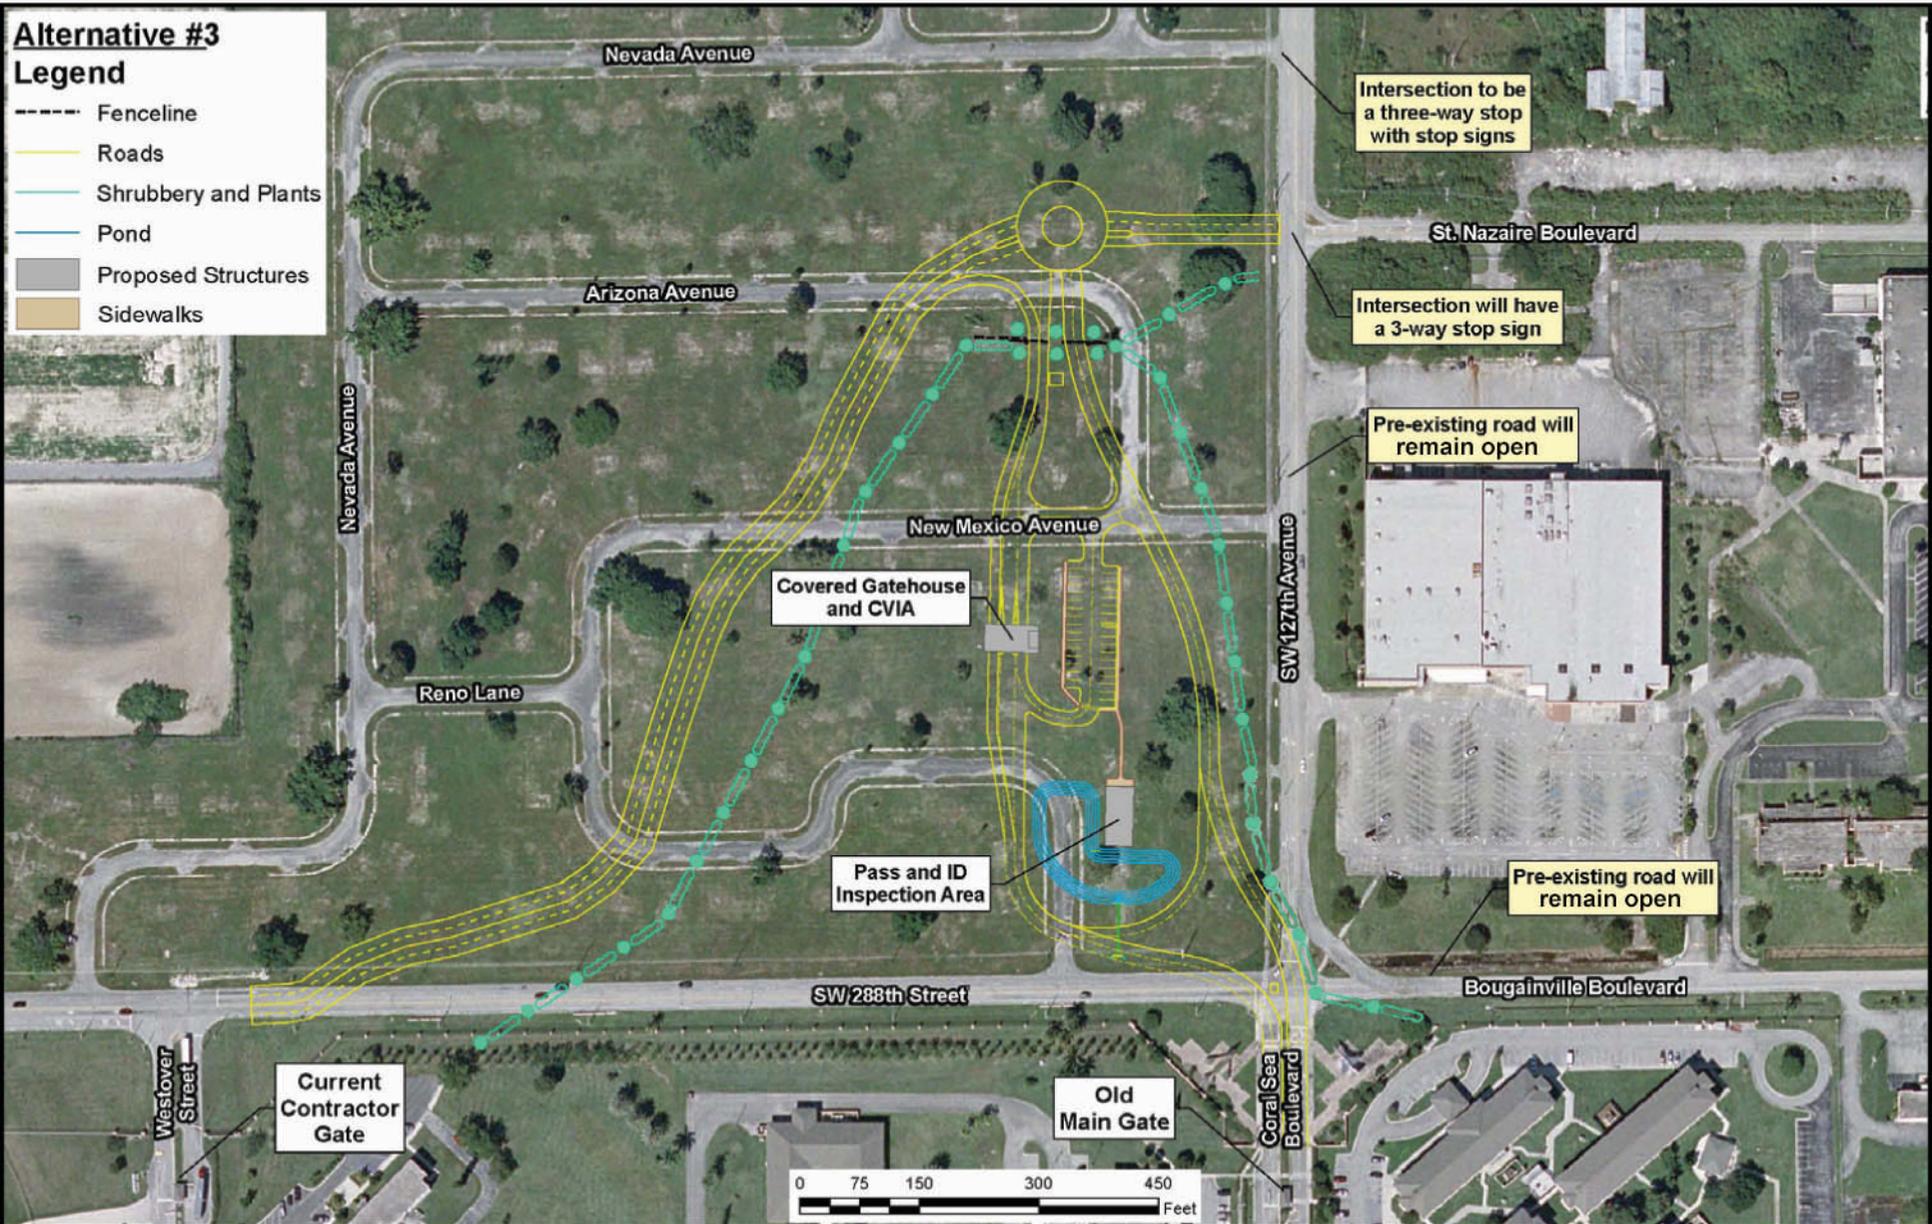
Site Plan of Alternative #3 as Modified by DP&Z
